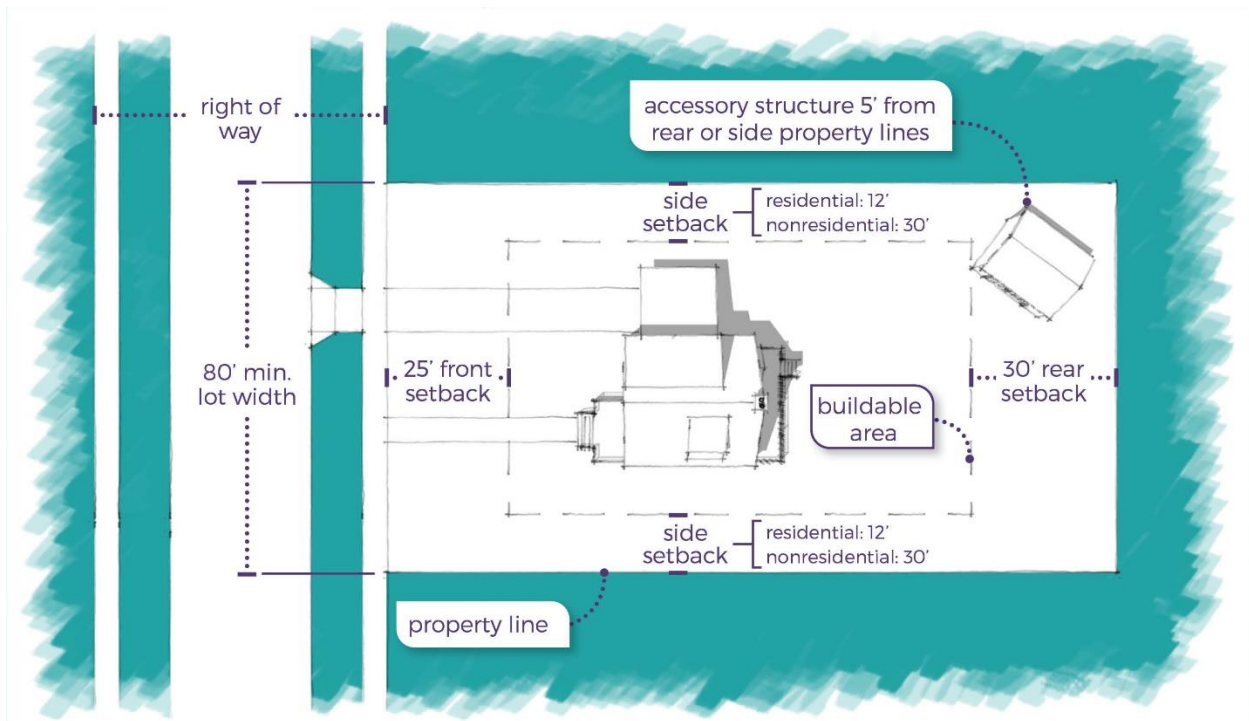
R-1 SITE DEVELOPMENT REQUIREMENTS
